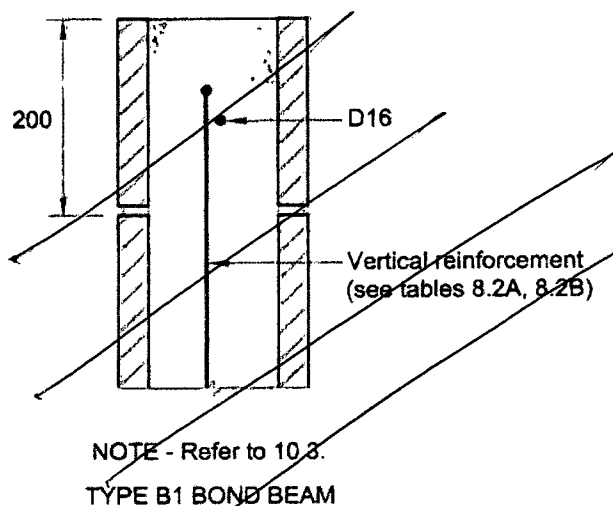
Bond beam details - Diaphragm system (see 10.3.2)
